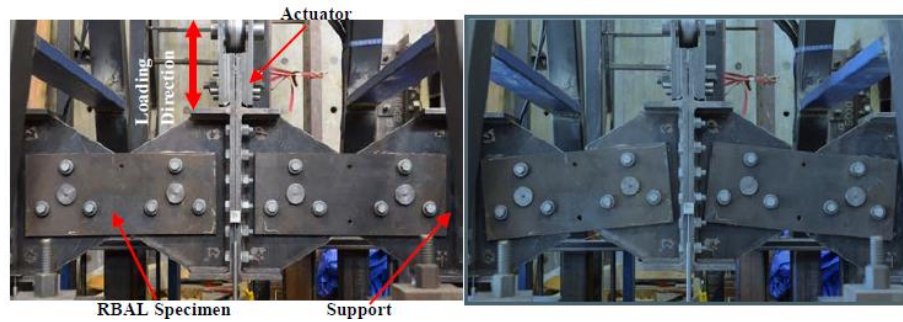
Eccentrically Braced Frames with the replaceable frictional shear link [109]
